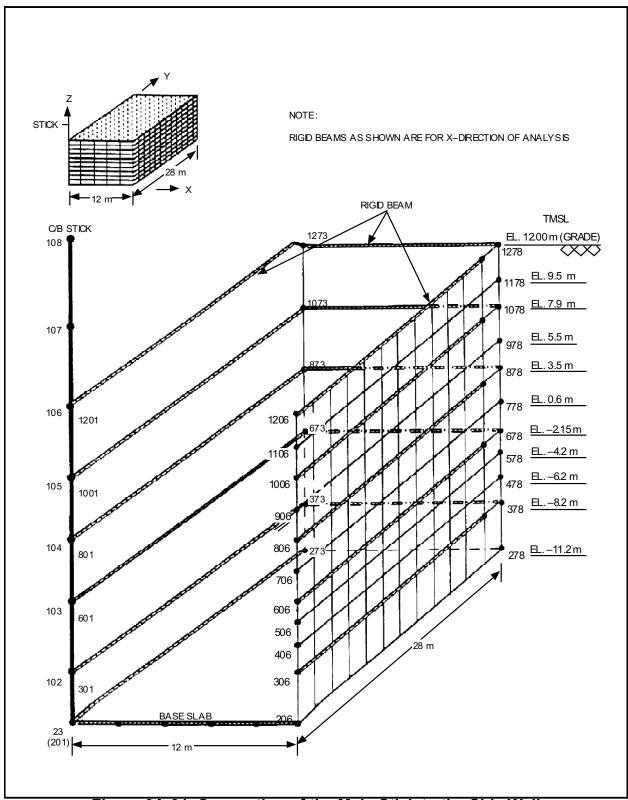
A-31 Connection of the Main Stick to the Side Wall (Control Building for UB Soil Profiles)
